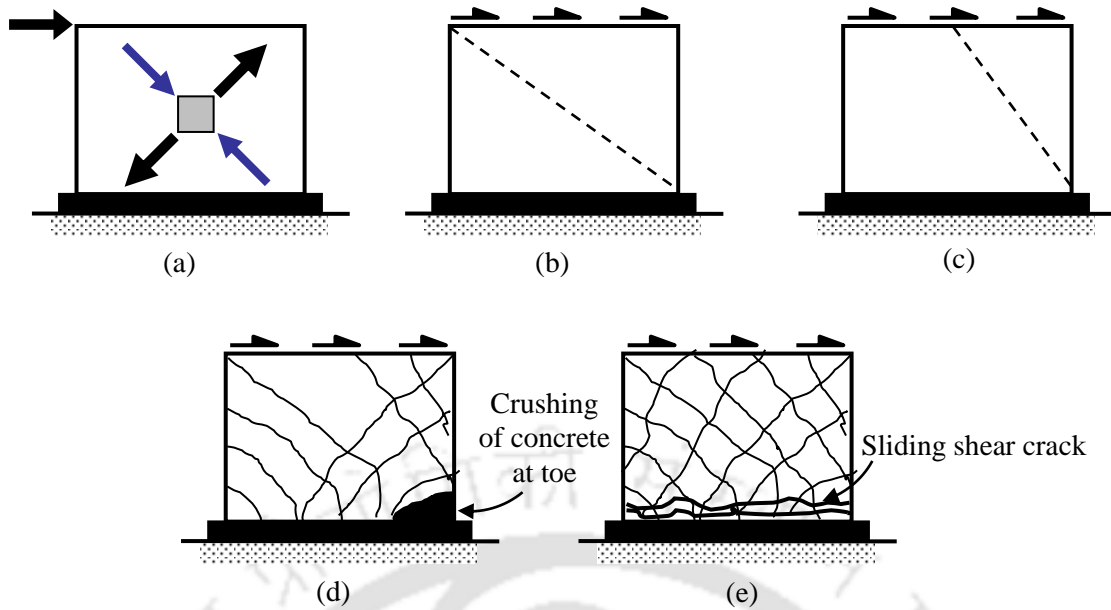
Failure modes in squat walls: (a) strut action, (b) predominant diagonal tension failure plane, (c) steeper tension failure plane, (d) diagonal compression, and (d) sliding shear.
